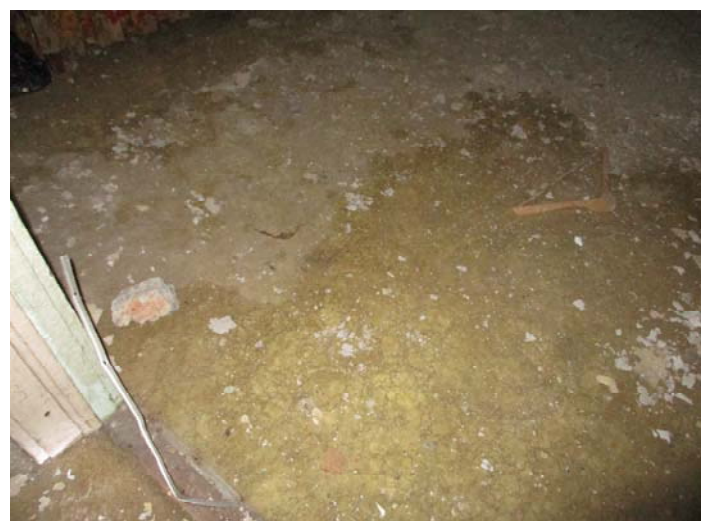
Tan rock fissure pattern roll vinyl floor over 4 layers of vinyl floors & adhesives in the dining room
